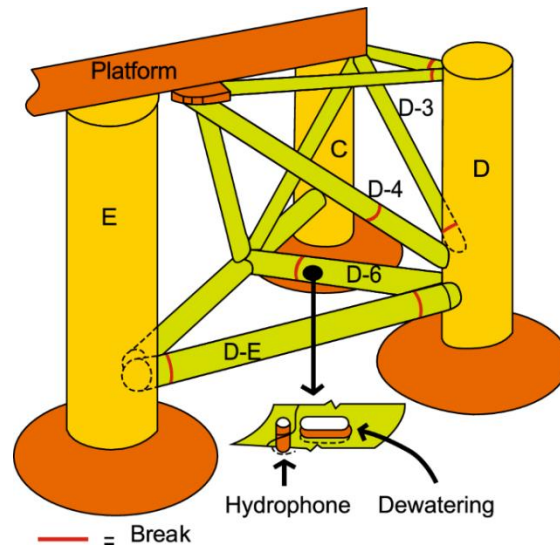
Position of fatigue fracture on D6 brace.
